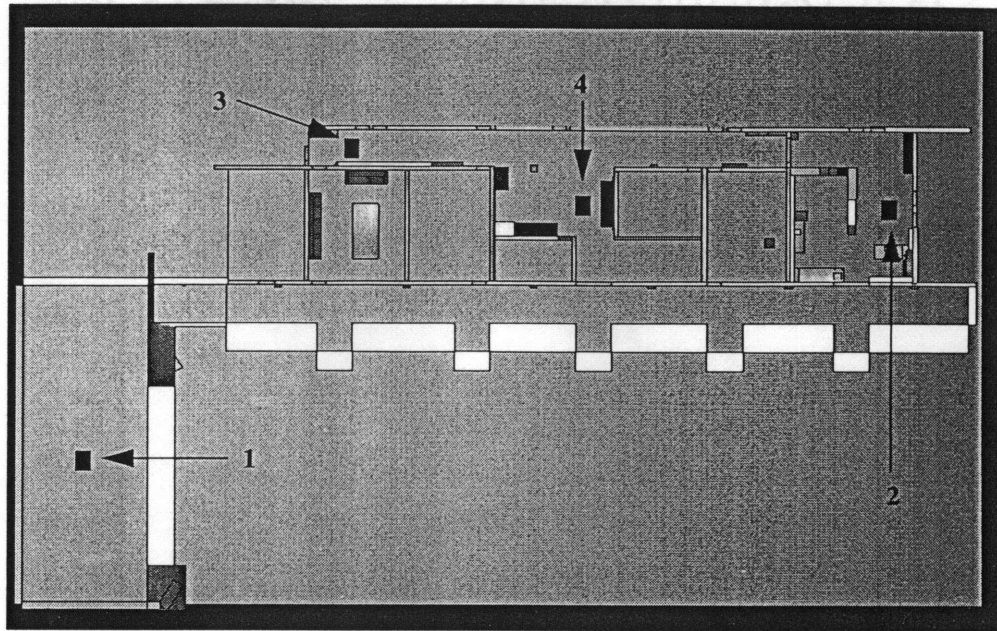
Overhead view of Building 36 7th floor floorplan with pointing locations labelled.
